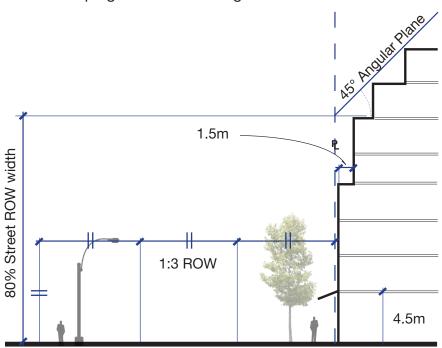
Illustration of Typical Mixed-Use Cross Section - Retail/Commercial Ground Floor
